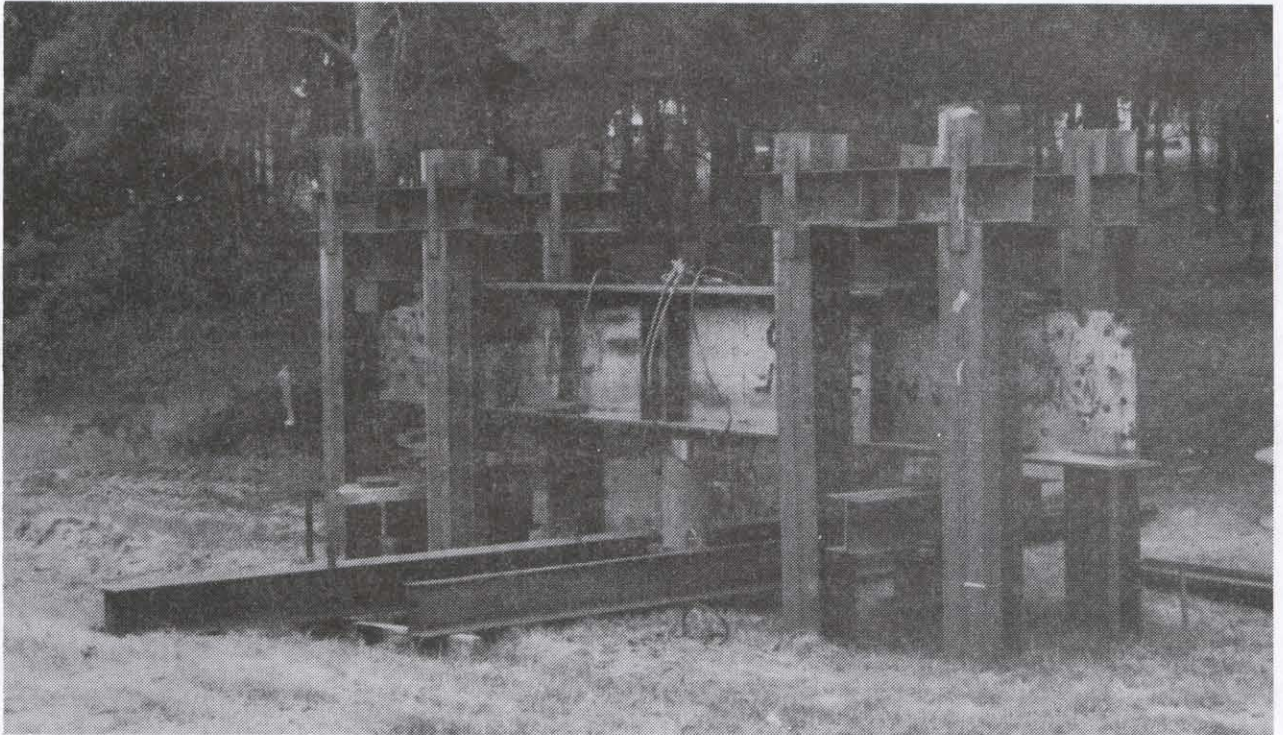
Typical Compression Load Test Arrangement with Reaction Piles
